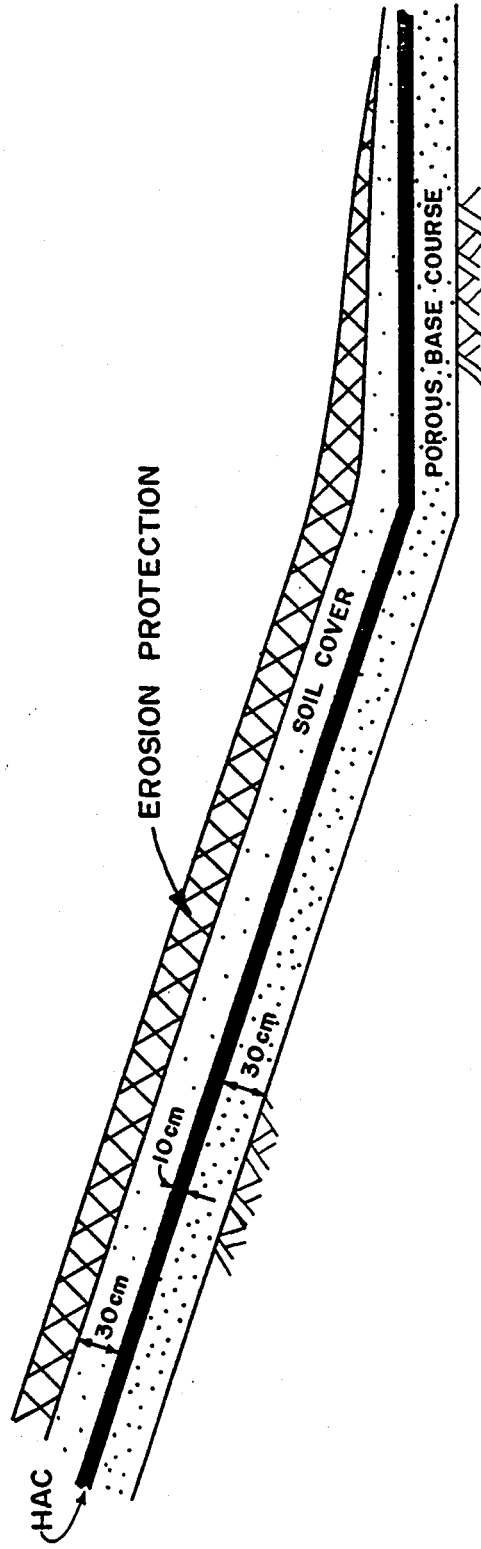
SCHEMATIC CROSS-SECTION OF HYDRAULIC ASPHALT CONCRETE (HAC) LINER
